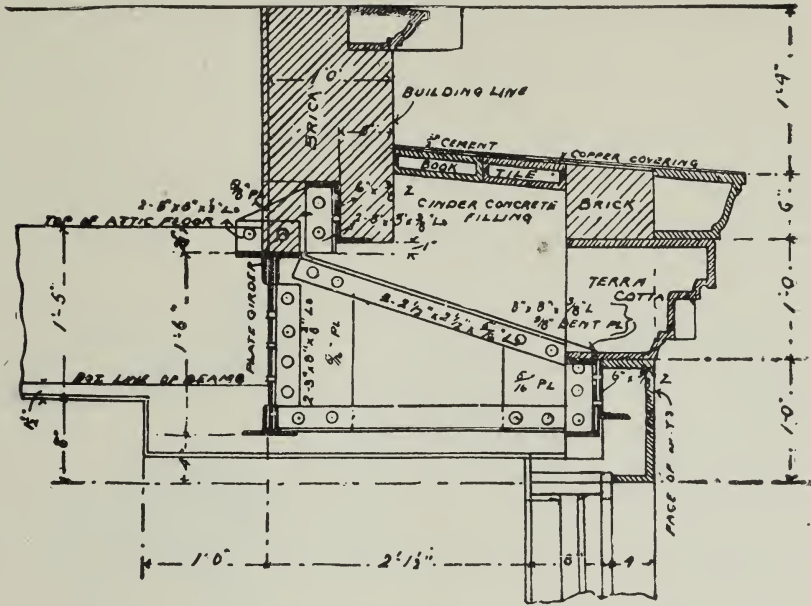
Bay-window. Section Through Head. Wyandotte Building, Columbus, Ohio.
